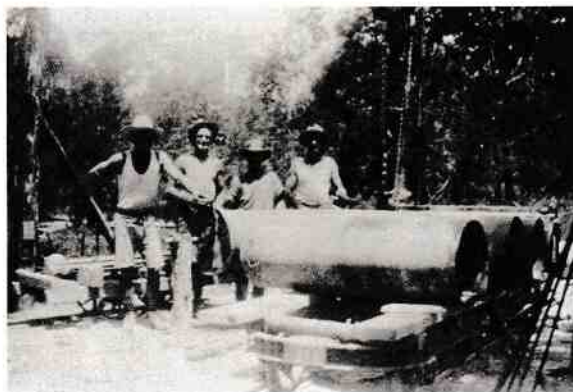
Ollera Creek pipeworks, Mt Spec Road in 1932. Hundreds of concrete pipes used in Mt Spec Road were made here.
